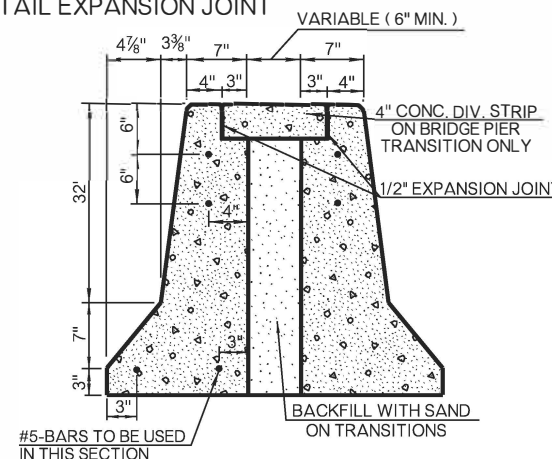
DETAIL OF TRANSITION SECTION AT BRIDGE ENDS
